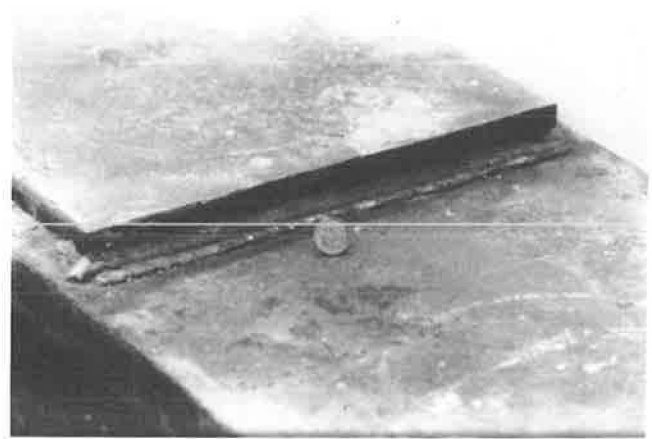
Irregularity in weld surface at end of cover plate.
